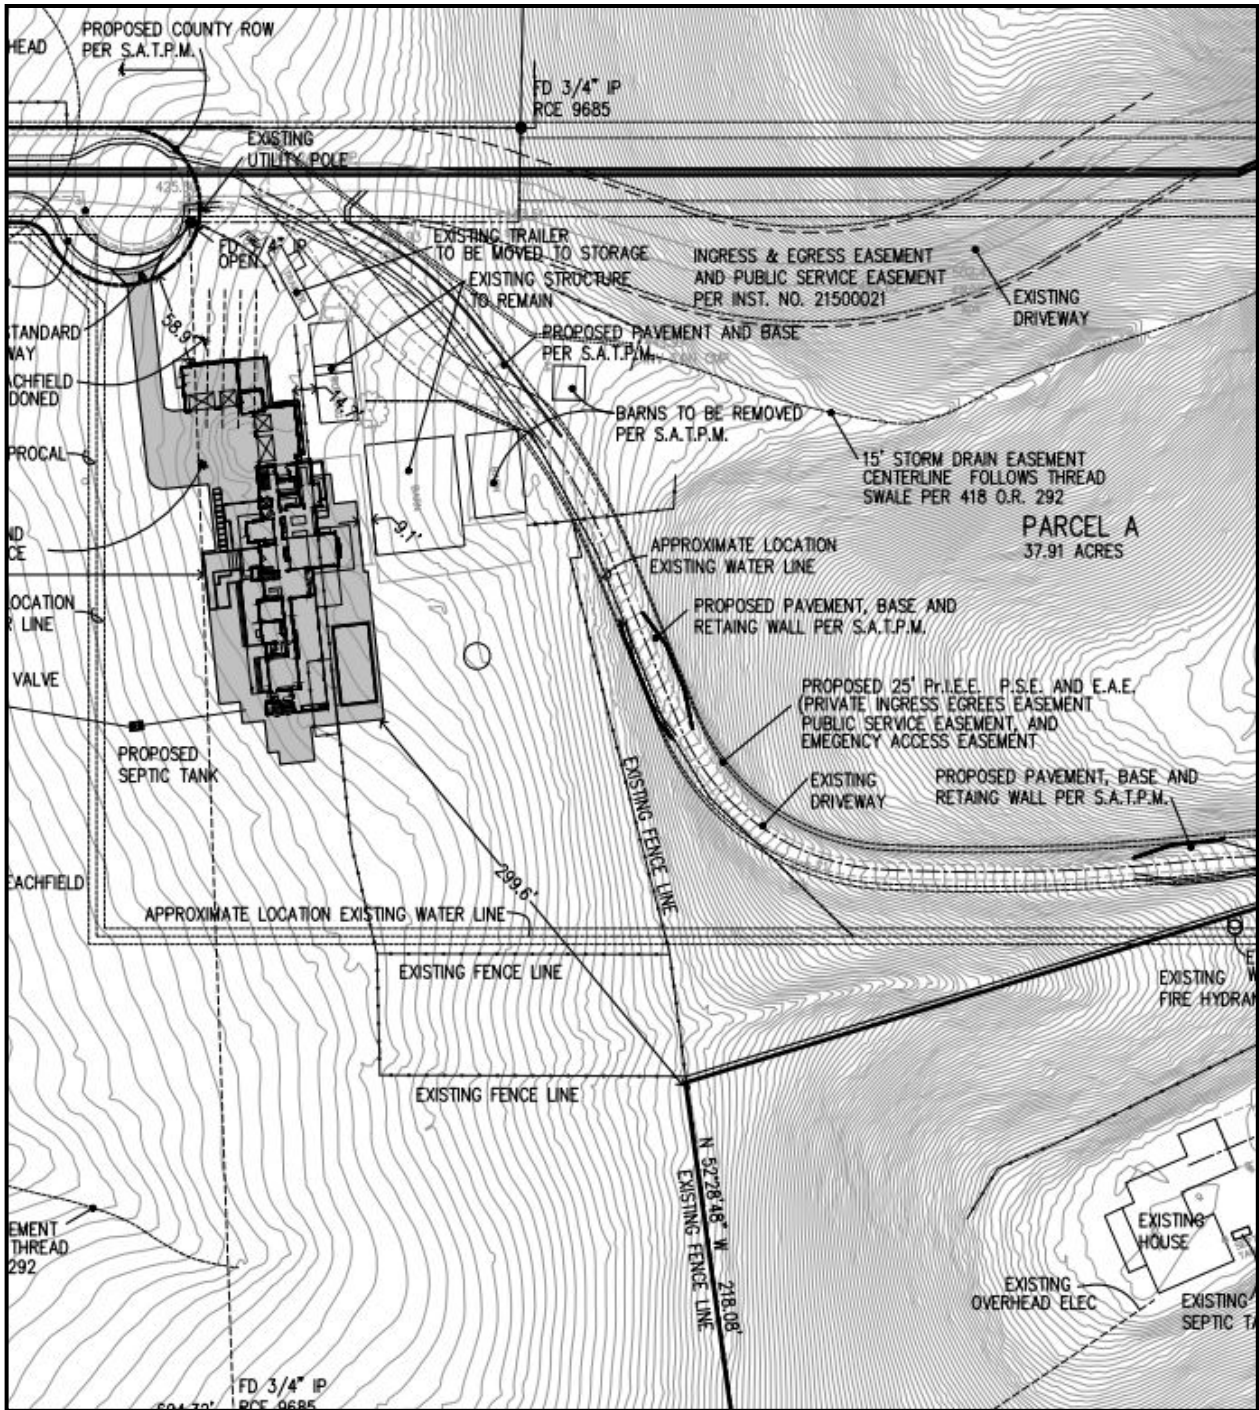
Site Plan for Residential Development Feasibility of Parcel A
